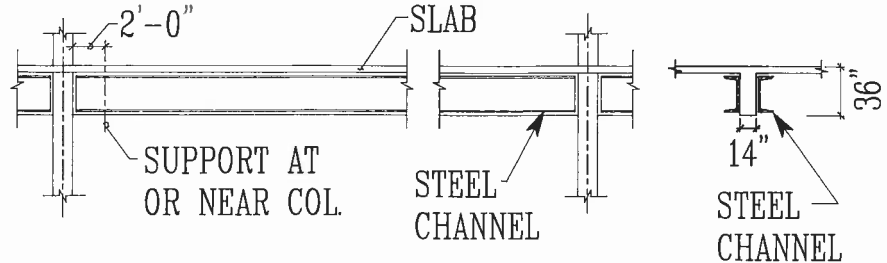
(center) Steel channels or I-sections were also considered as alternatives.
